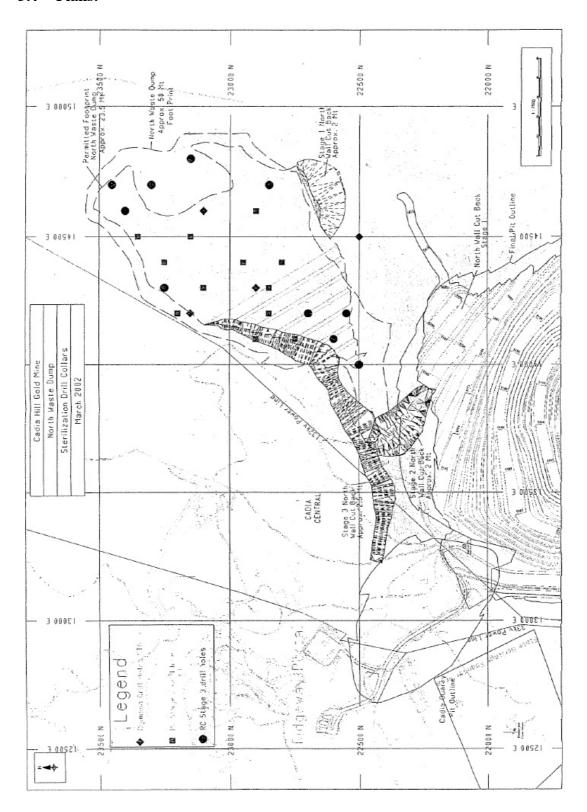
Site plan of proposed Northern Waste Dump, showing location of site recorded during site survey.
